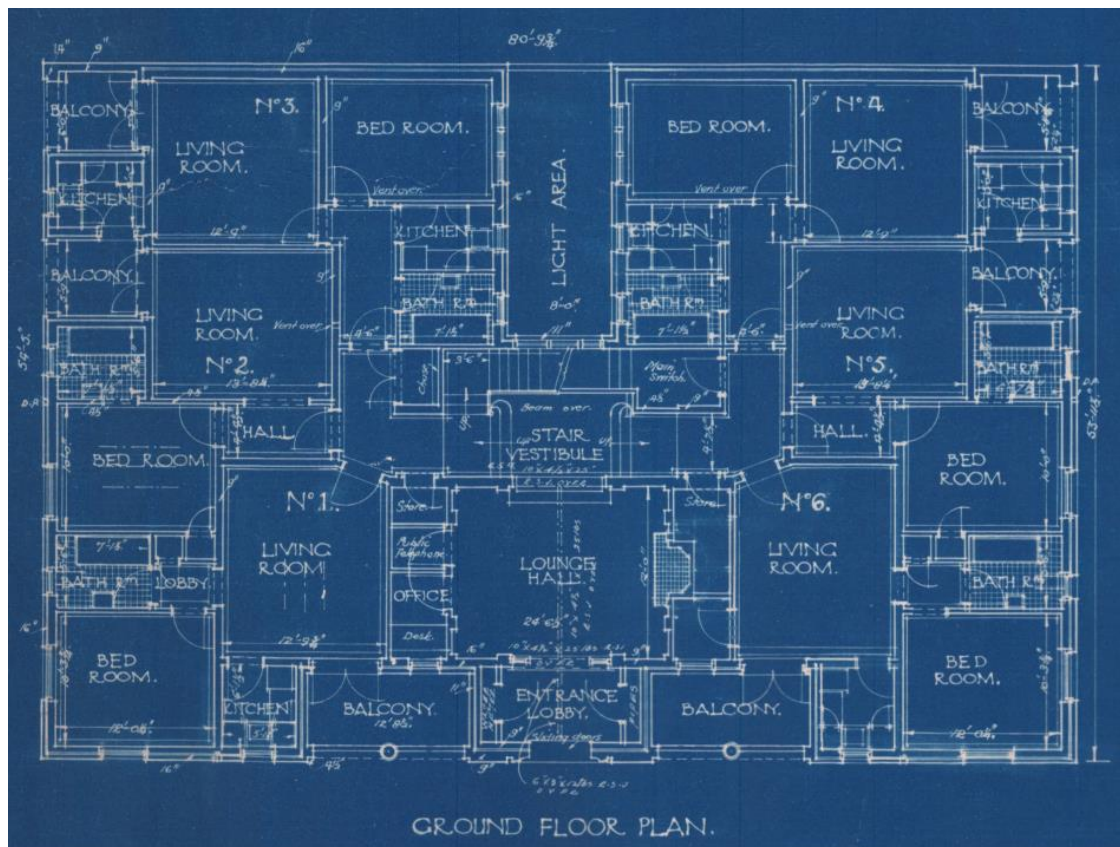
Original ground level plans and layout of Wilkinson House, 1926.
